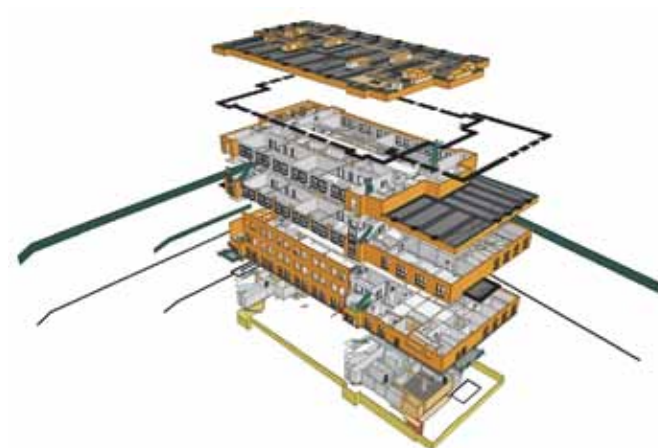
Set of reinforcement products for the frame of a building from large-sized precast concrete modules on the BIM platform
